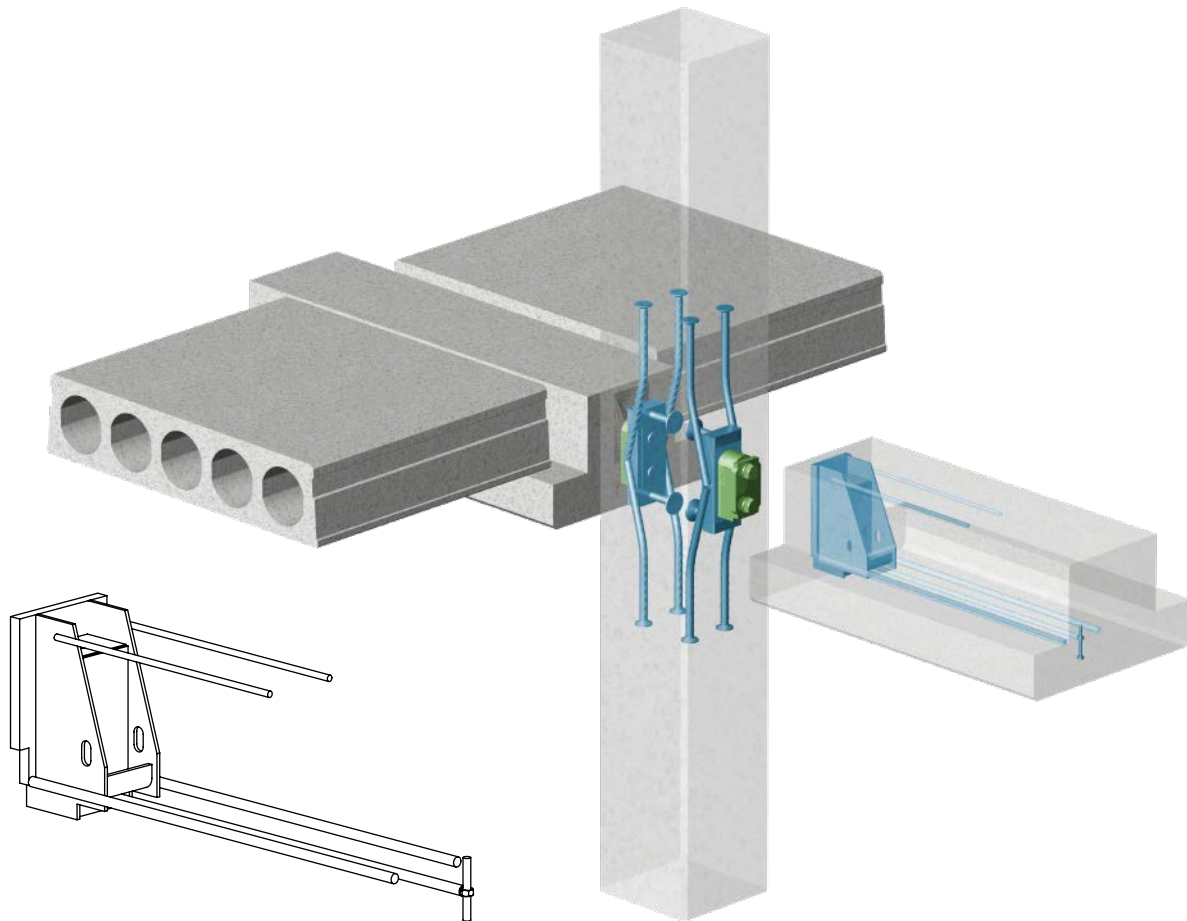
PCs® Corbel system (PCs® Corbel + PC® Beam Shoe) with a reinforced concrete beam.
